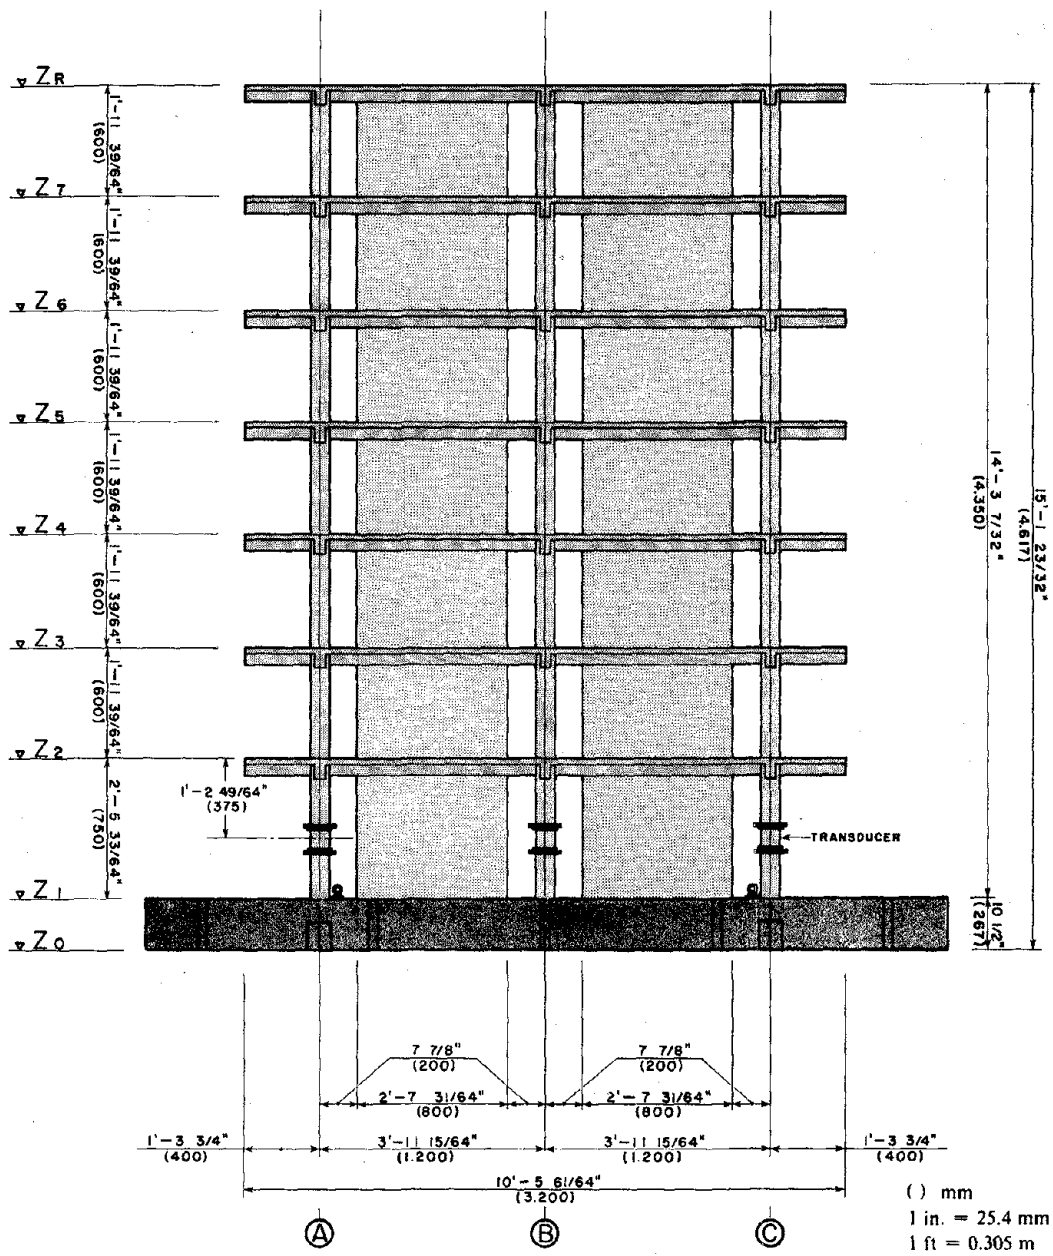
FRONT ELEVATION OF THE 1/5-SCALE MODEL.
